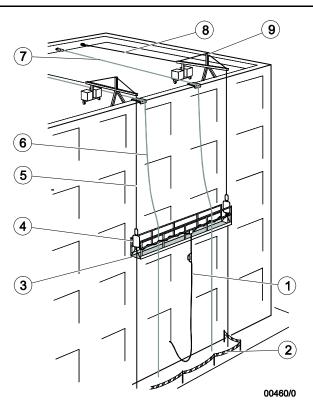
Typical suspended scaffold installation with a single primary rope suspension system
